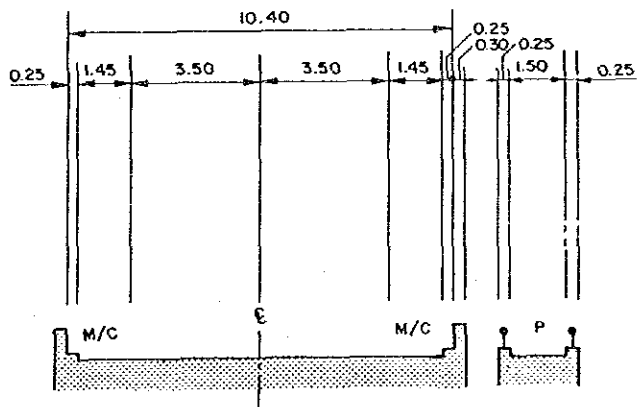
ALTERNATIVE PLAN ON THE BRIDGE SECTION
